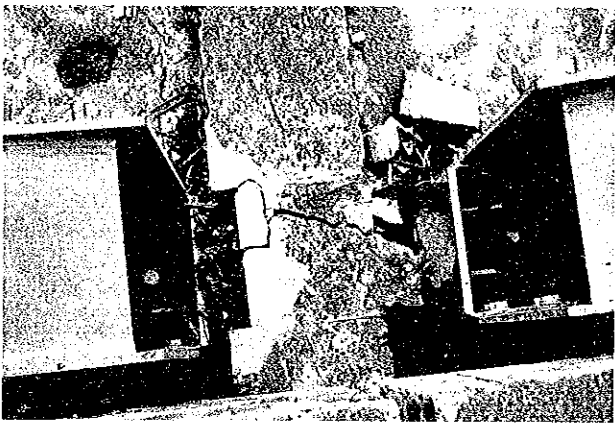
Failure of Concrete Block for Stopper
